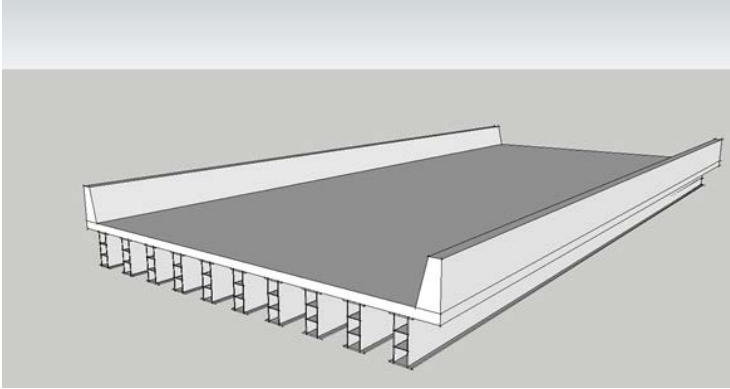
Conceptual design for Strongwell DWB36 pultruded girder bridge.
